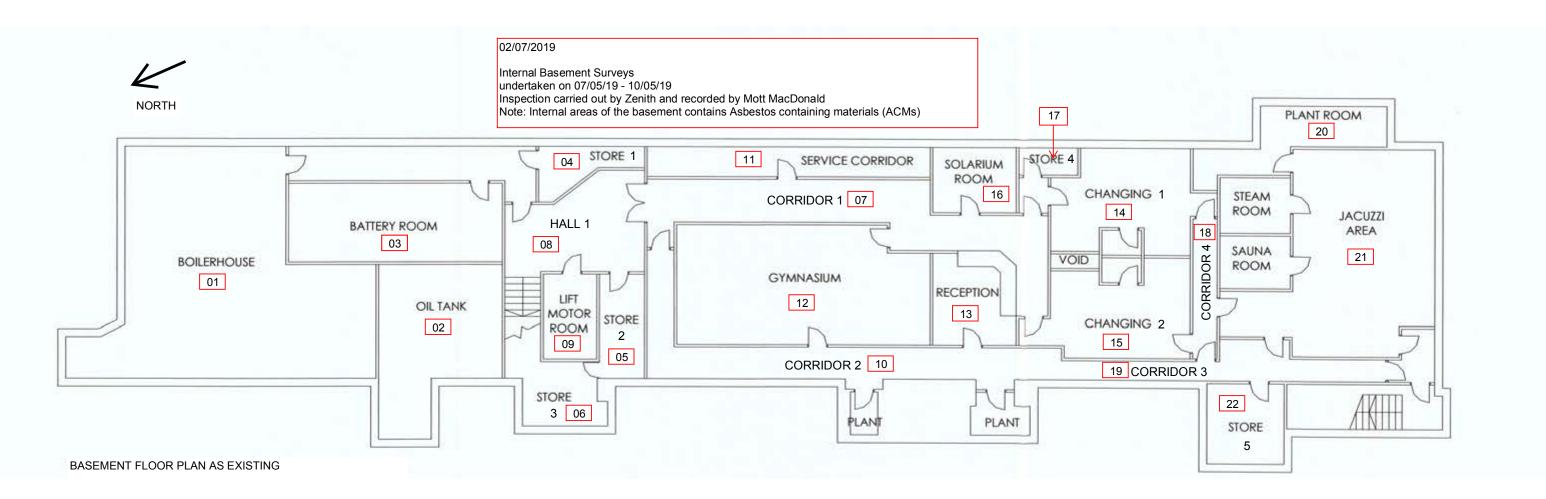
Plan of Station Hotel Building South Block Basement showing Internal Survey Defect/Observation Locations
